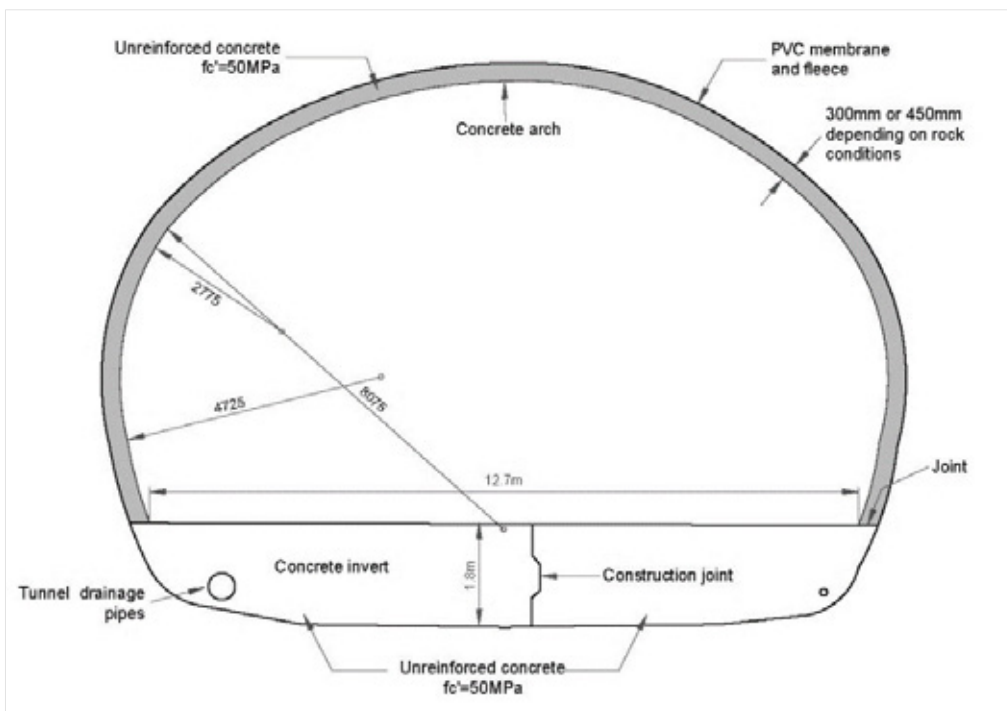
Cross-section through the as-designed permanent lining of Burnley Tunnel
